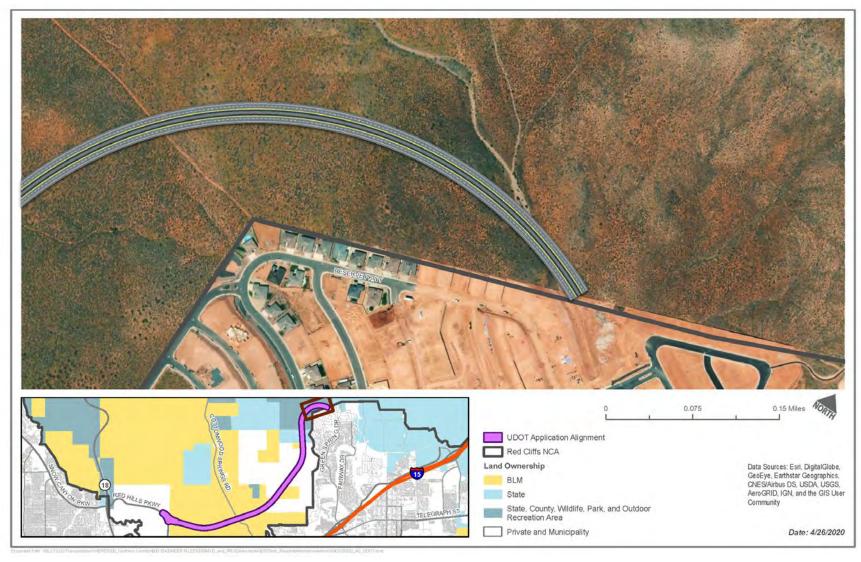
UDOT Application Alignment Plan View (9 of 9)
